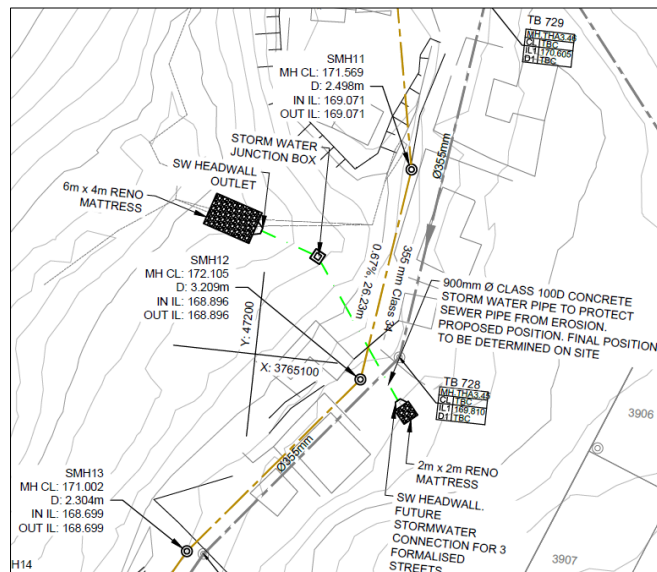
Diagram showing plan view of the proposed stormwater headwall outlets. The upslope headwall discharges to a concrete pipeline which transfers stormwater safely across the sewerline downslope to an outlet where it discharges onto a reno mattress in the stream bed.
